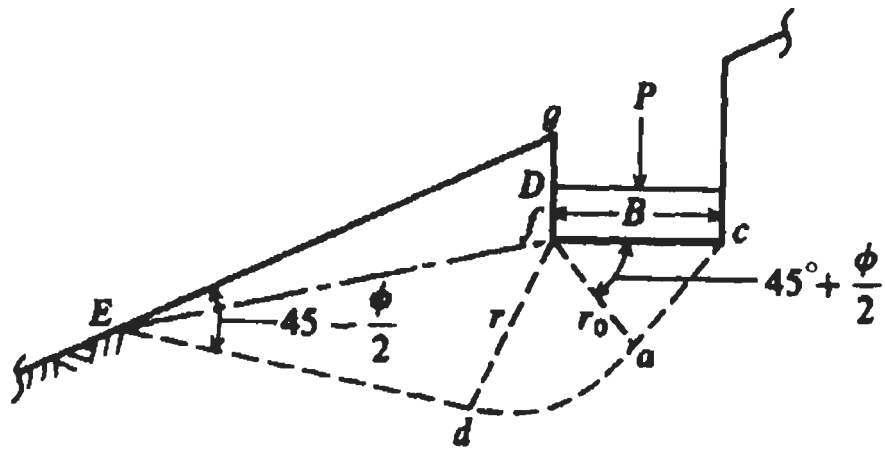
Schematic Diagram Showing Slope Failure under a Foundation Load (Siva Reddy and Mogaliah, 1976)
